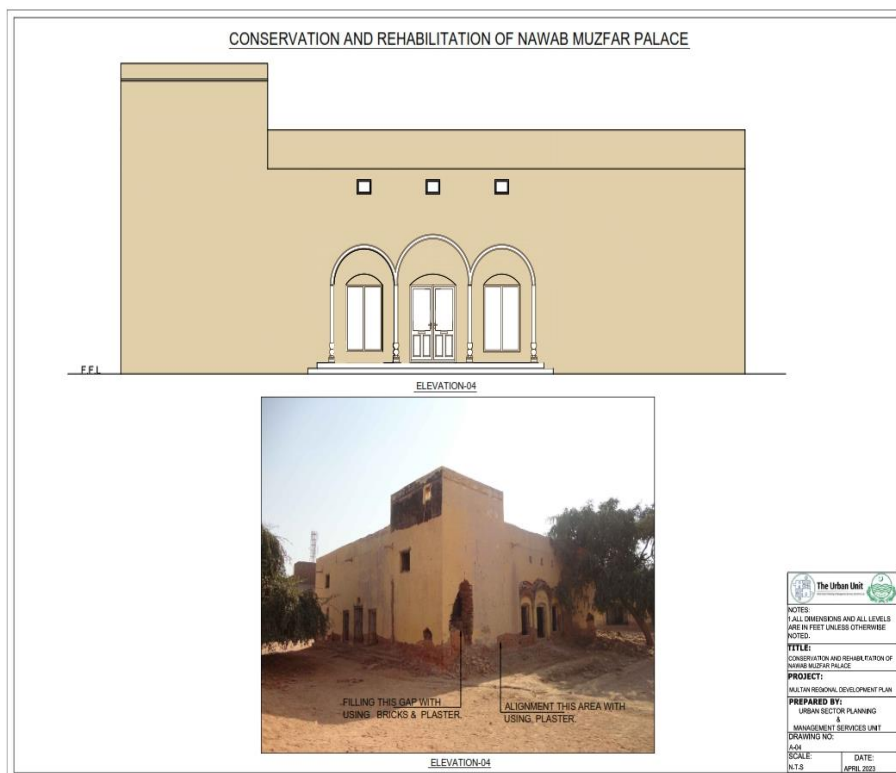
Proposed Conservation Plan of Muzaffar Khan Palace
